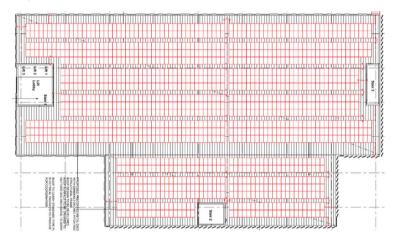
Plan showing in red, indicative roof mounted PV. - Sourced from Stantec. (Plan orientation rotated 90 degrees)
